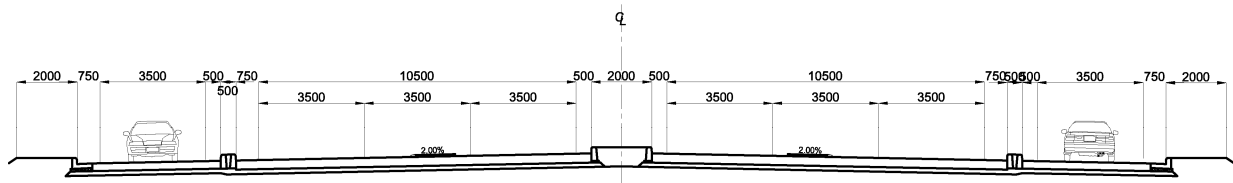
Side Road Arrangement at Grade Separation Intersection
